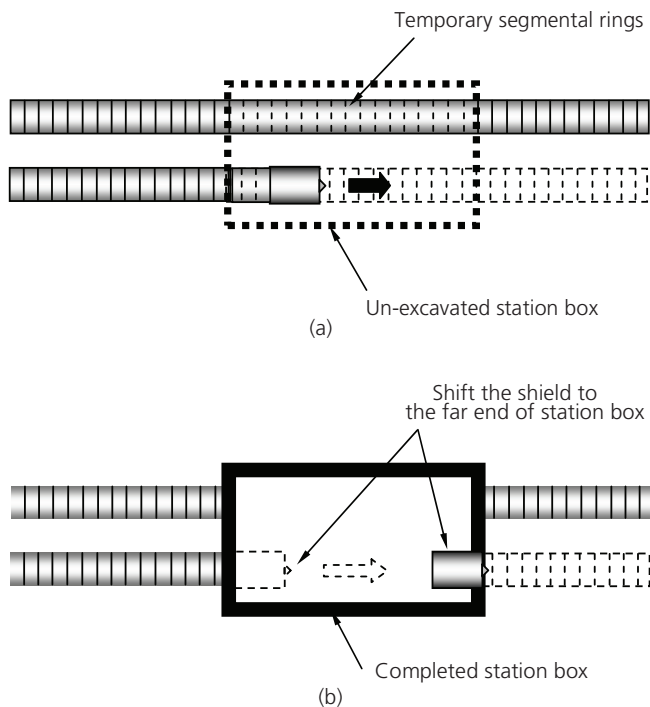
Construction methods for tunnelling and underground stations of the Bangkok MRT Blue Line project. (a) Construction method of the North section; (b) construction method of the South section
